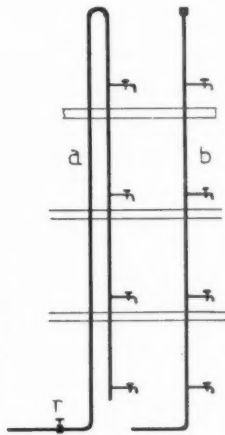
(a) Taps on all floors of a high building can work at about the same pressure. (b) Taps working at widely different pressures.
